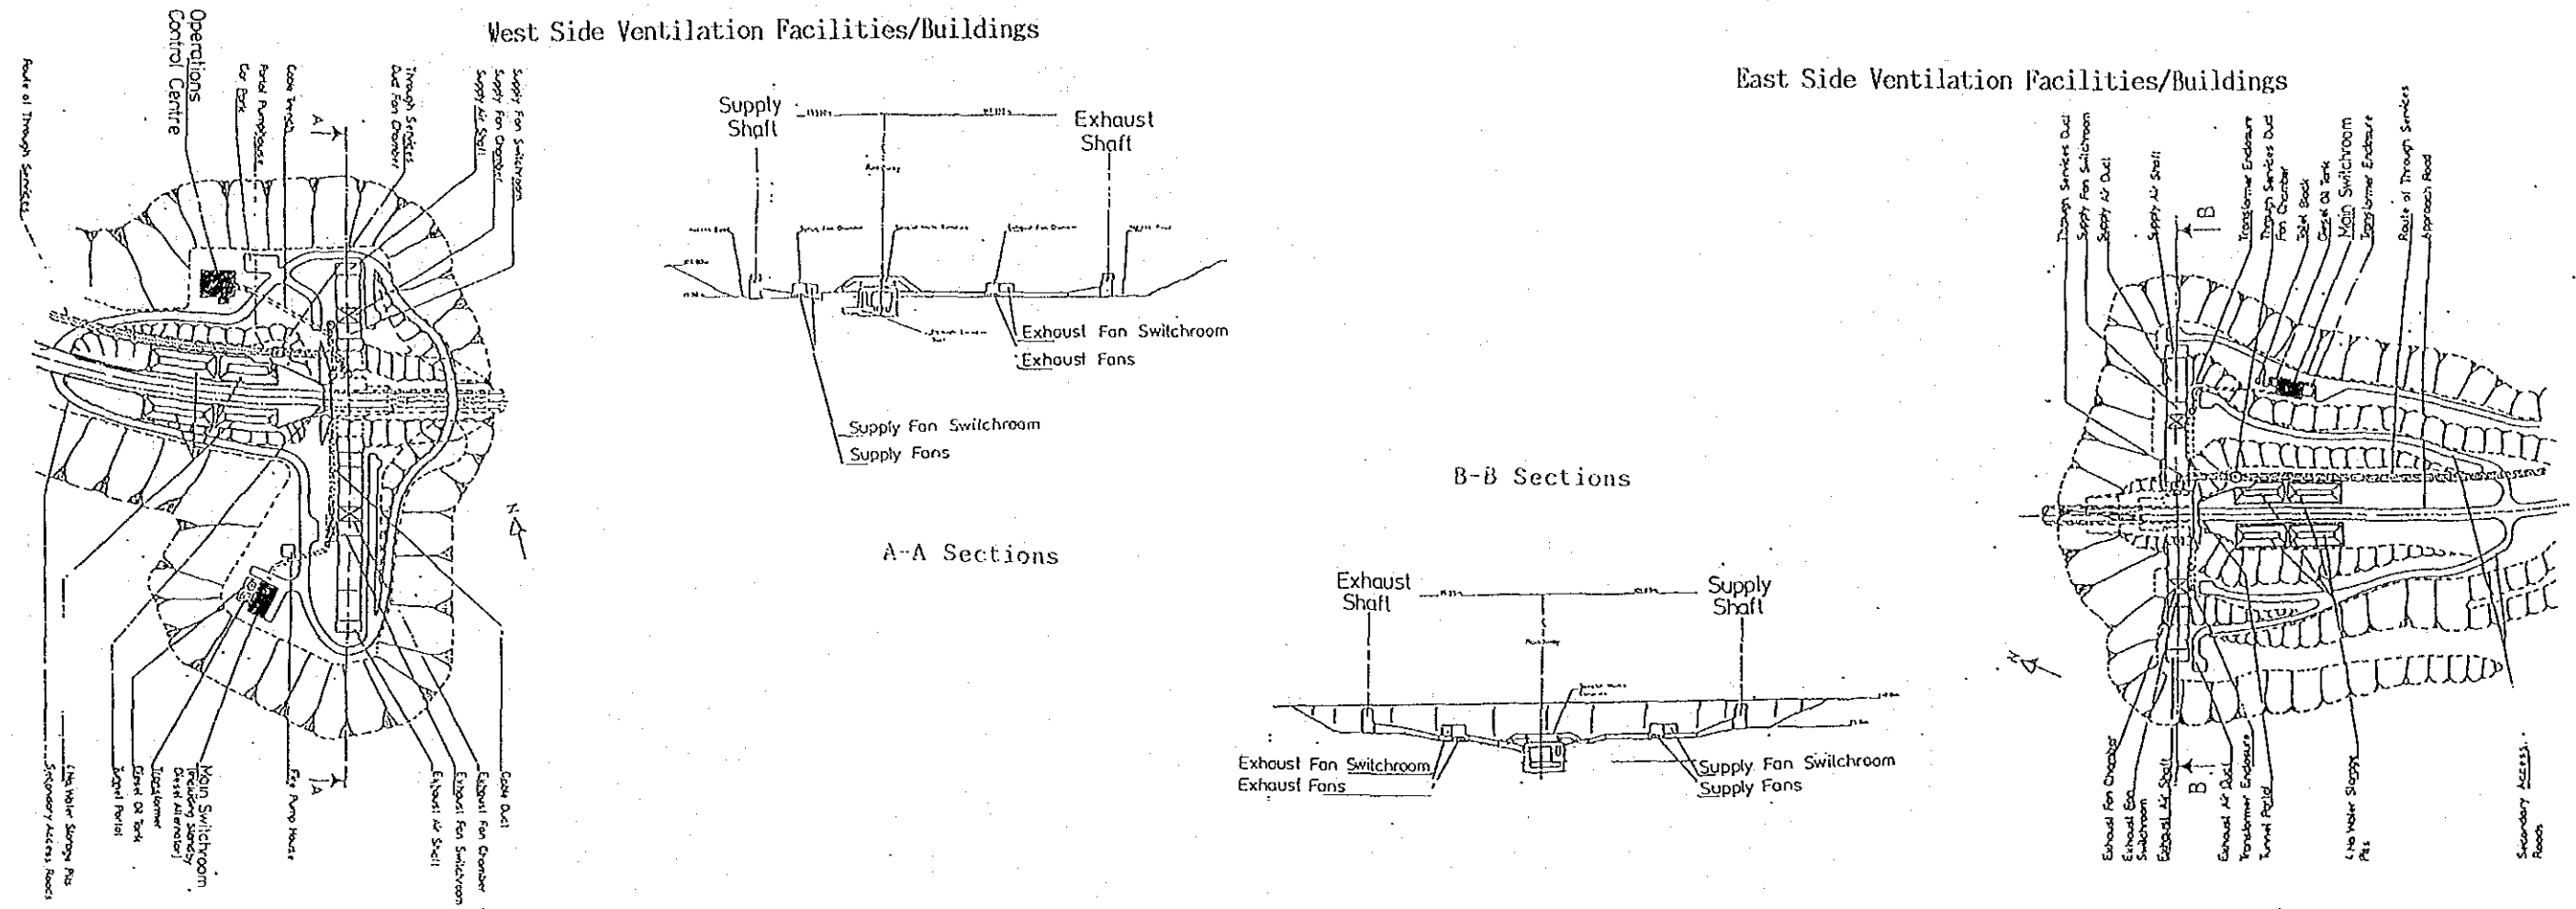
LAYOUT OF THE EXISTING VENTILATION FACILITIES
